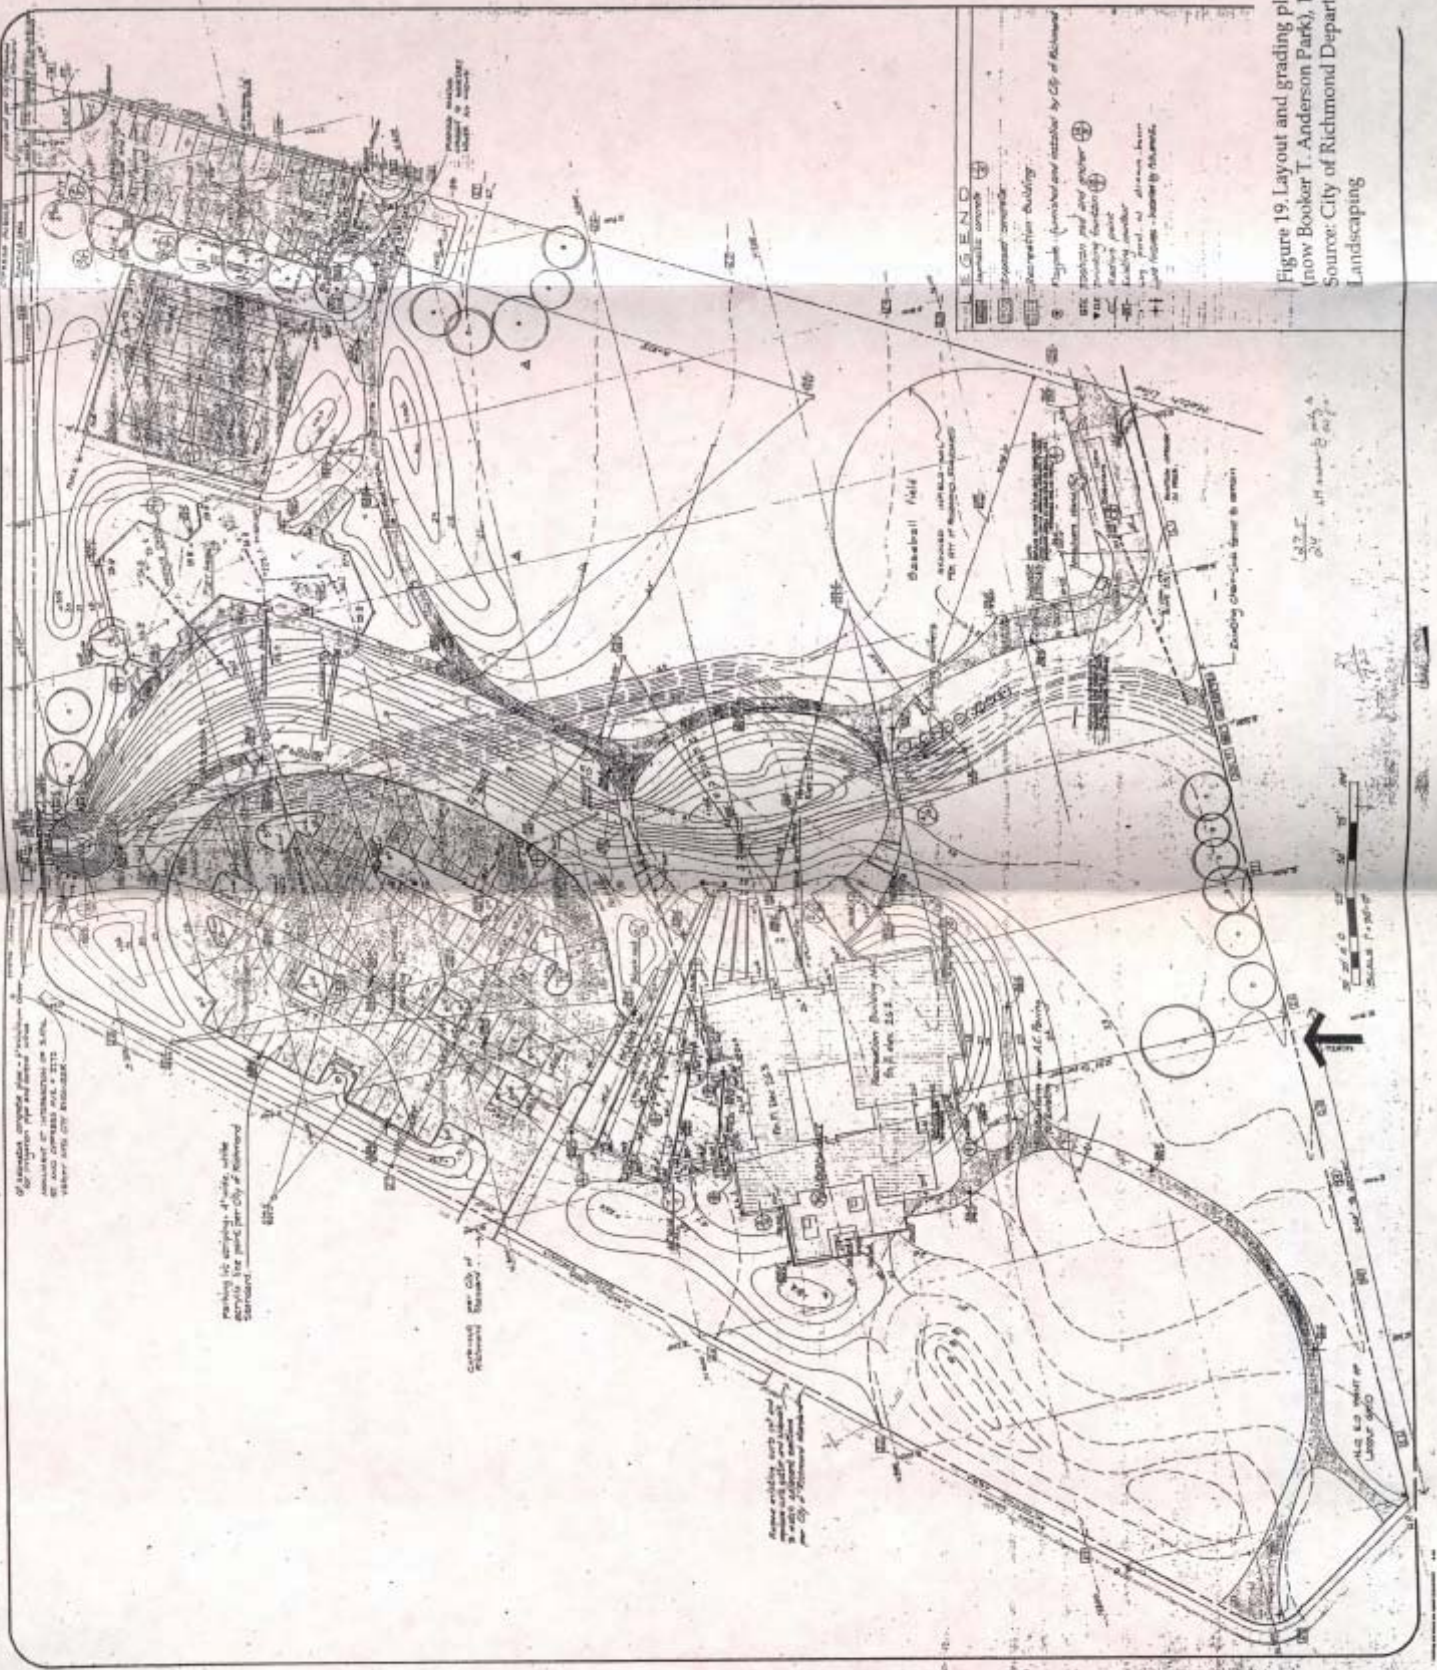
Layout and grading plan for Eastshore Park (now Booker T. Anderson Park), 1970.
